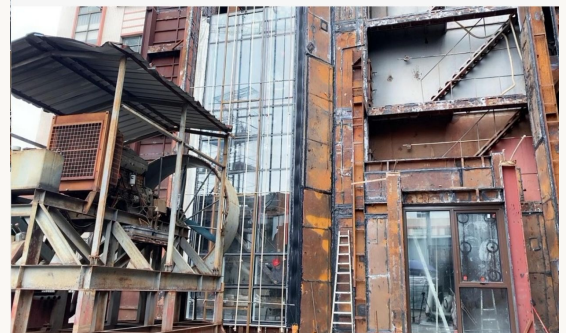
· LIVE PMU REVIEW — FASCLAD TECHNICAL TEAM & CLIENT REPRESENTATIVES
